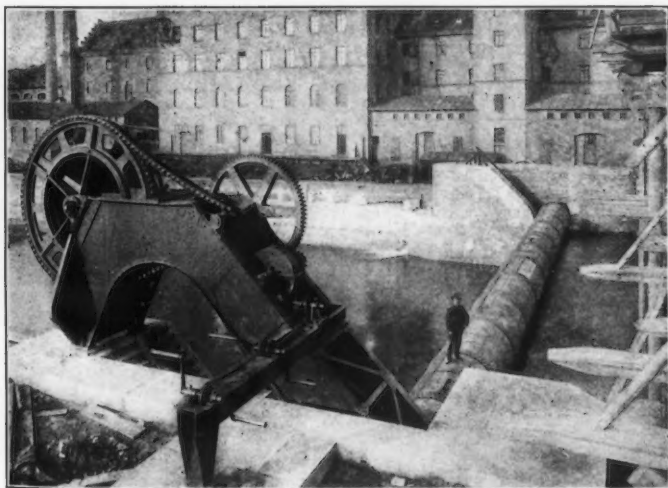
THE LARGER SCHWEINFURT DAM.
